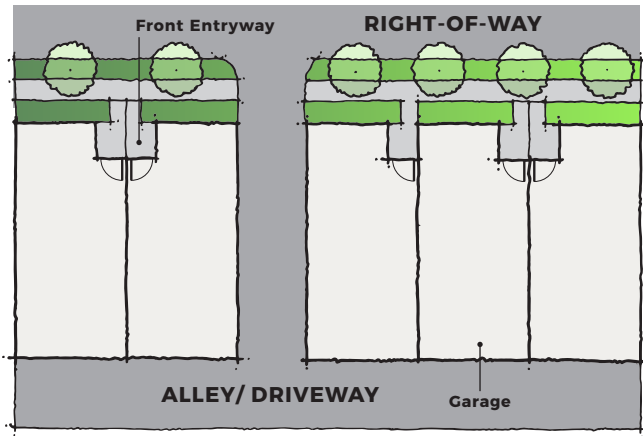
Small lot homes that have street frontage shall be oriented toward and have direct pedestrian access to the public right-of-way.
